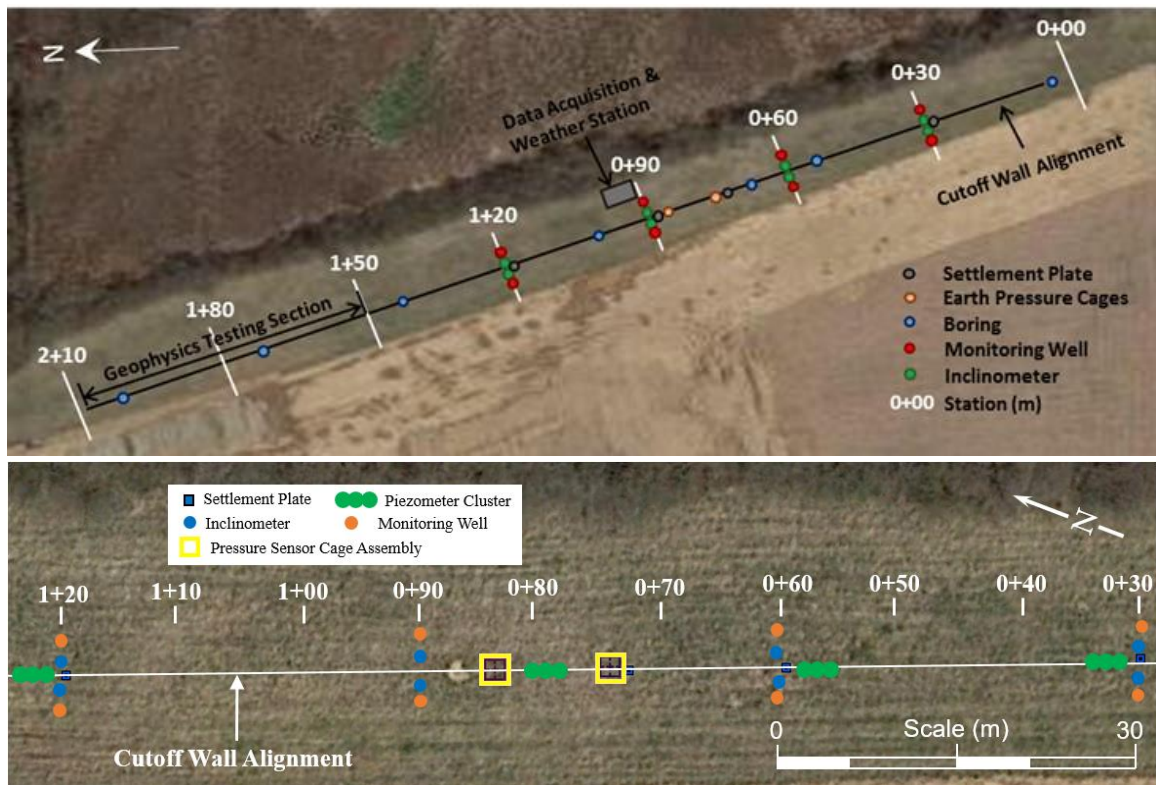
(a) Cutoff wall alignment with locations of exploratory soil borings, monitoring wells, inclinometers, earth pressure cages, and settlement plates; (b) section of wall from 0+30 to 1+23 m expanded to show instrumentation.
